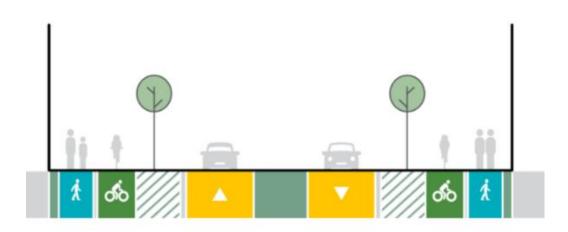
Indicative design between Kahikatea Flat Road and Postman Road – 24m cross section
